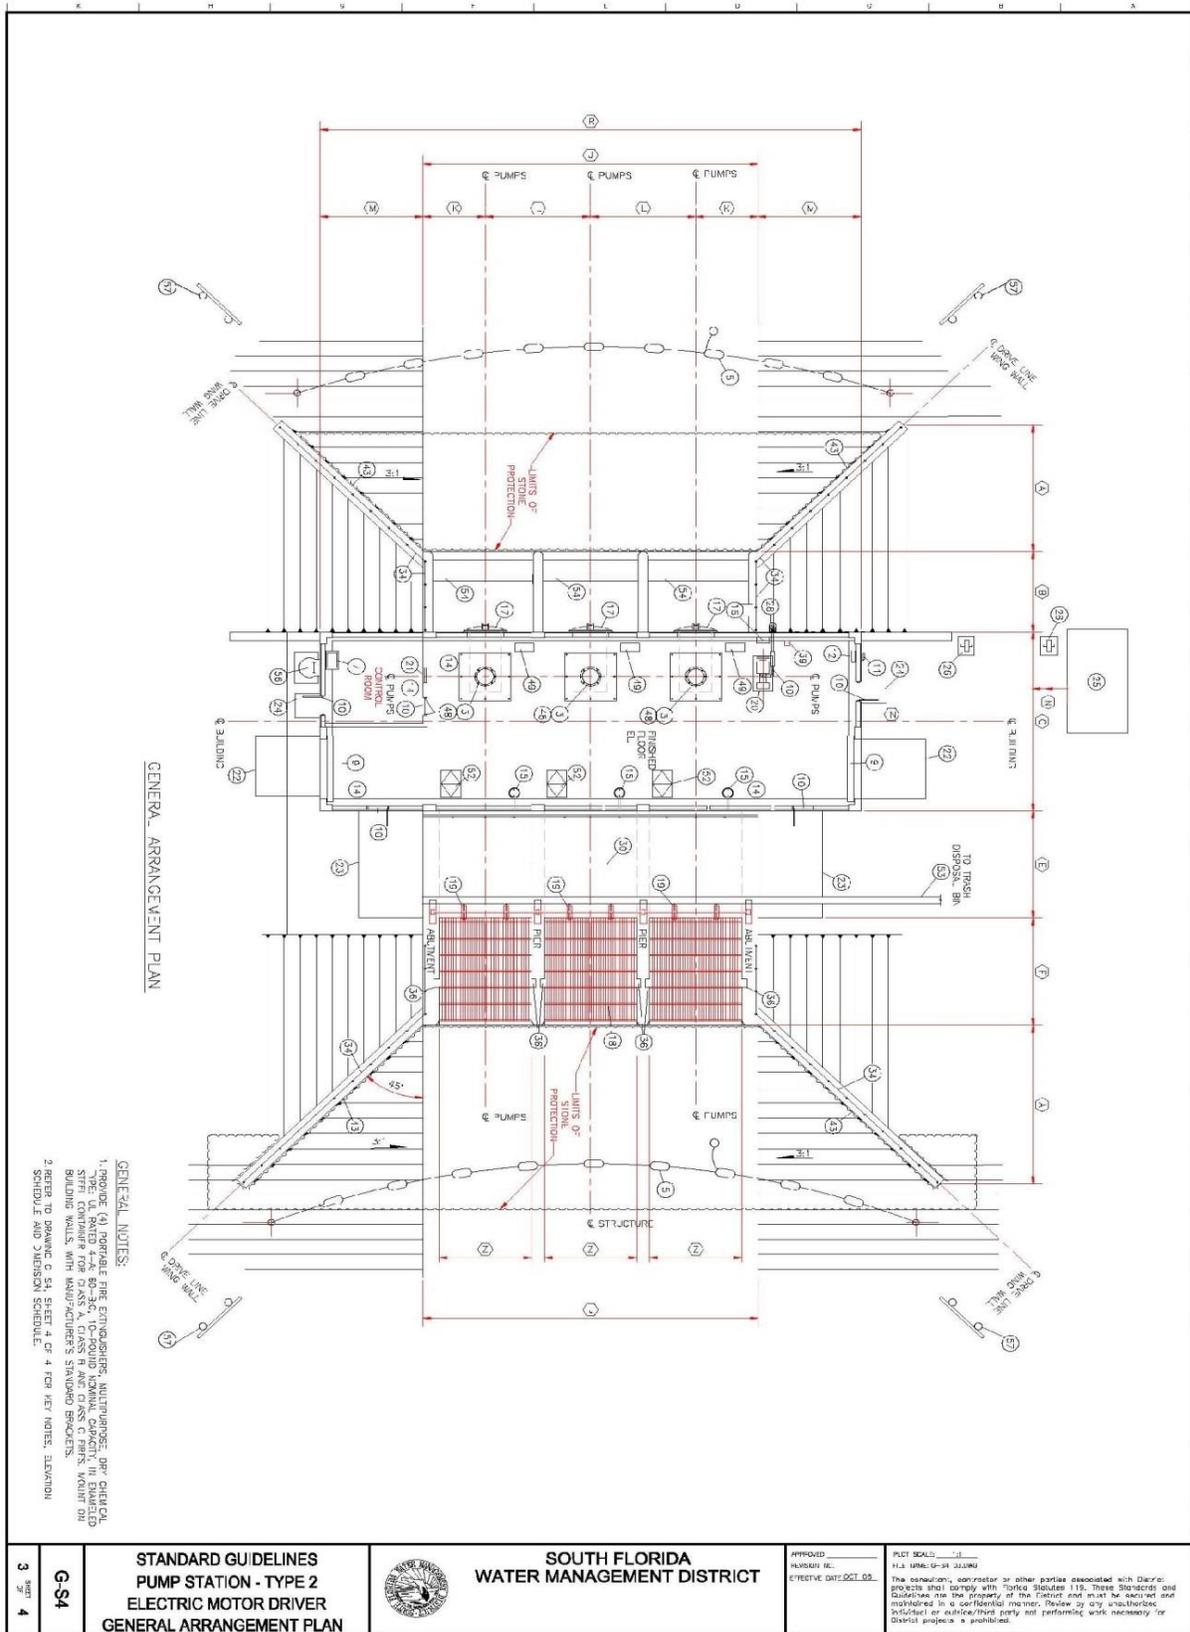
Standard Guidelines: Type 2 Electric Motor Driver, General Arrangement Plan
